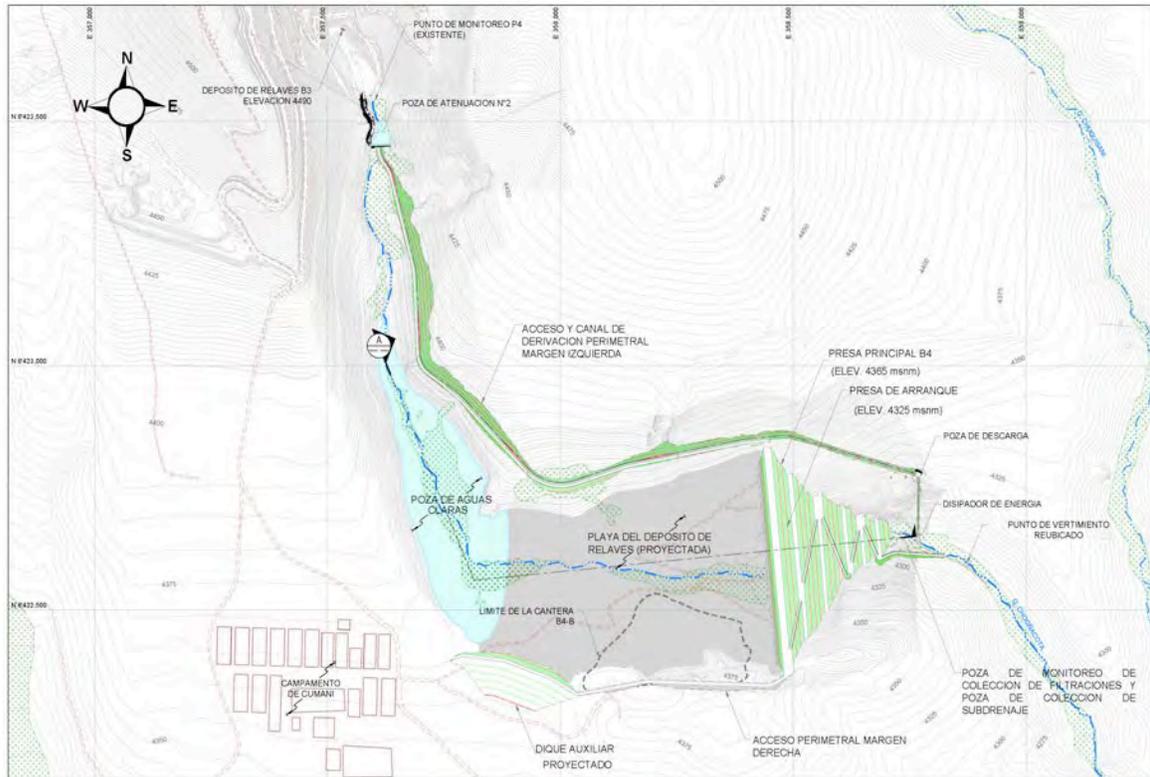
Tailing Storage Facility B4 (Knight Piésold, 2016).
